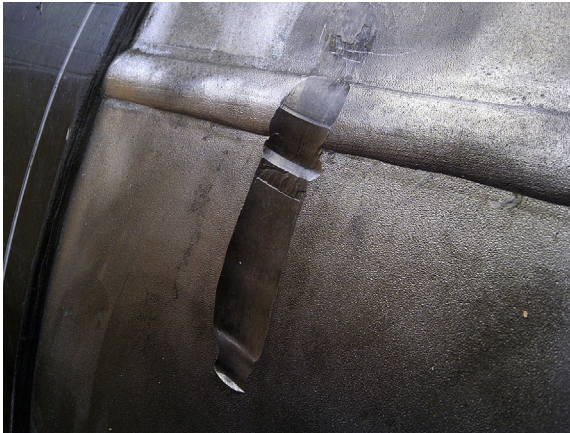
Defect in the 32-in. pipeline also affecting the seam weld.
